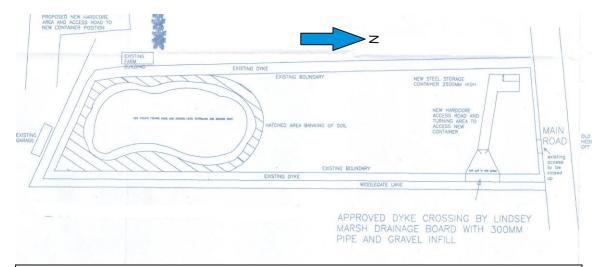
Proposed layout of the development site at an original scale of 1:500 (not to scale), (extract from Architects plan)
